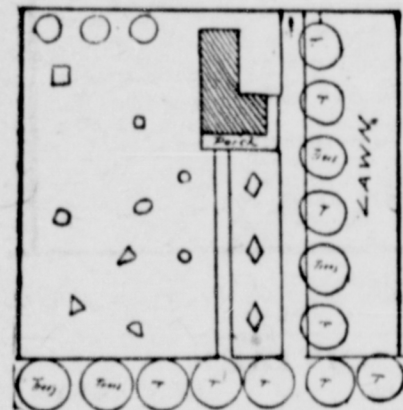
TYPICAL FARMYARD ARRANGEMENT.
